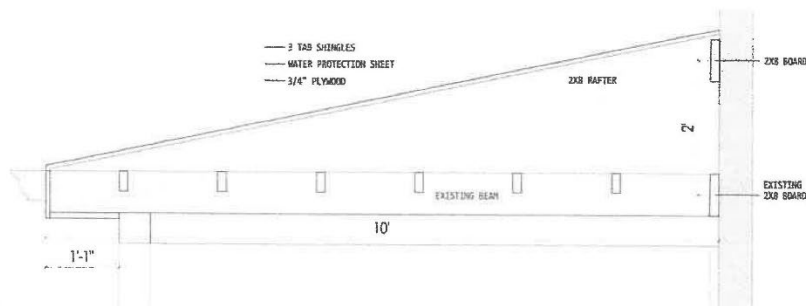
The proposed roof plan will include skylights, top, and a shed roof covered with 3-tab shingles.
